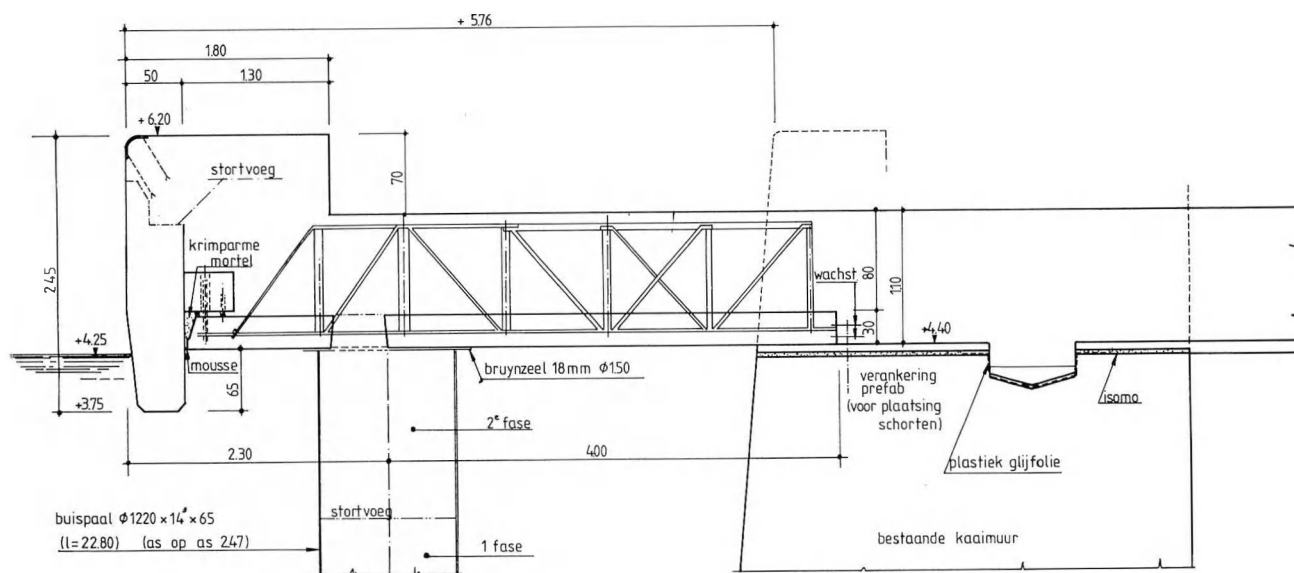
Detail of prefabricated elements supported by partition walls and quay walls.
